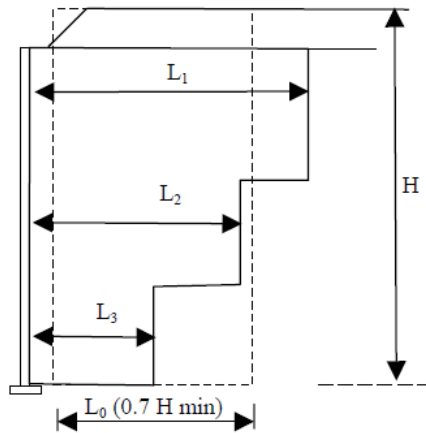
Trapezoidal MSE Wall. (FHWA, 2009)
